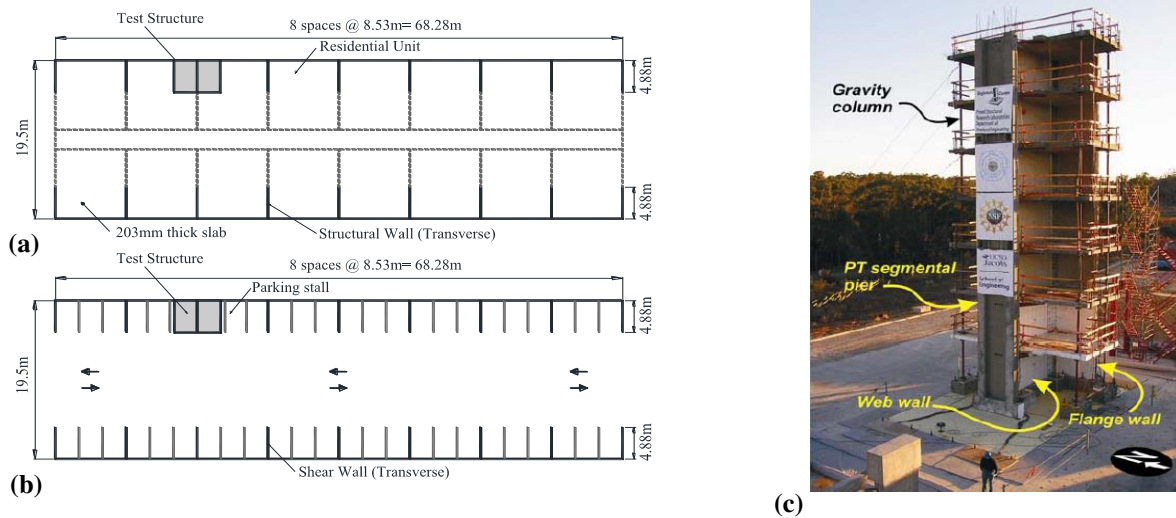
Prototype building and test structure used in modeling verification: (a) Residential floor plan; (b) Parking floor plan; and (c) Perspective view of the test structure (Panagiotou et al. 2007a)
